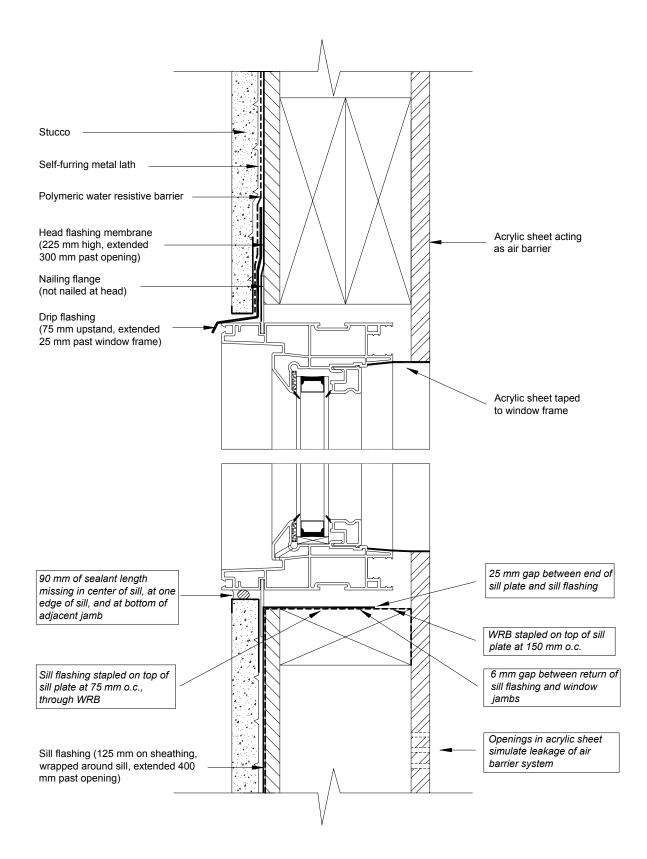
Wall/window interface for specimens No. 1 and No. 3 - vertical section
